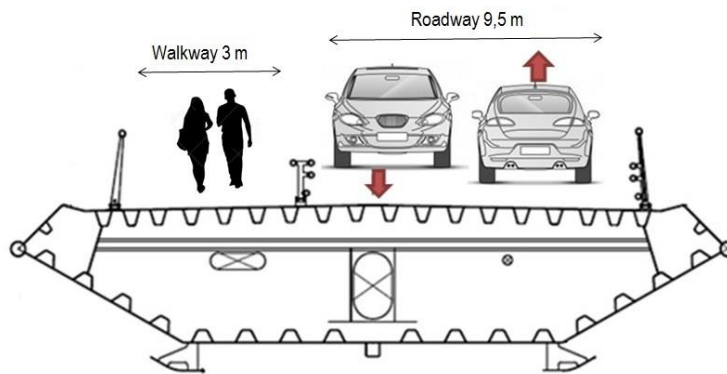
Cross section of the load-bearing unit with roadway and walkway widths.
